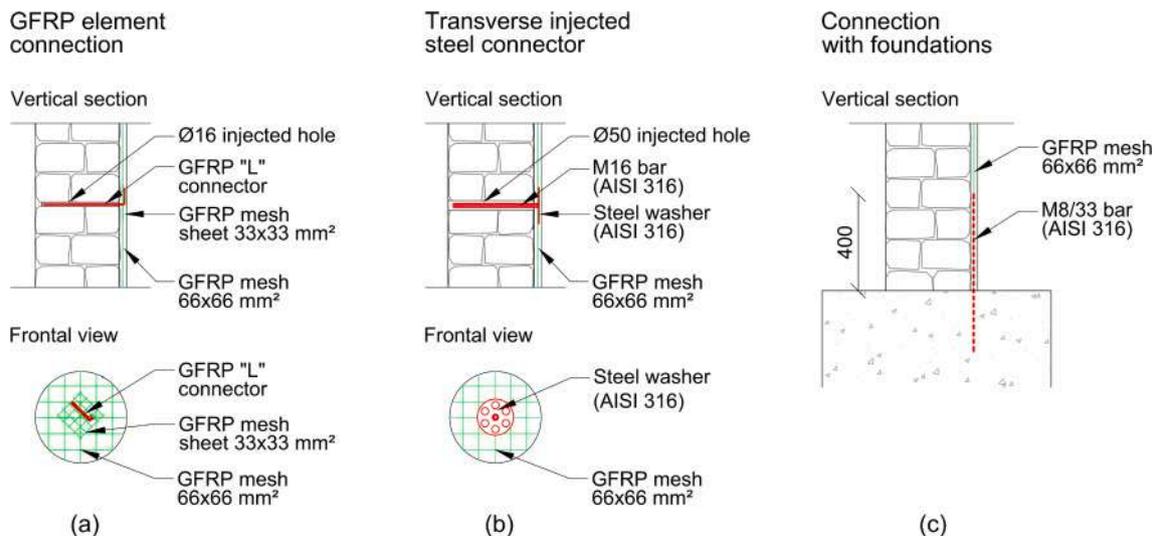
Details of the retrofitting intervention: connection to the wall with (a) GFRP elements, (b) transverse injected steel connectors and (c) connection to the foundation by steel bars.
